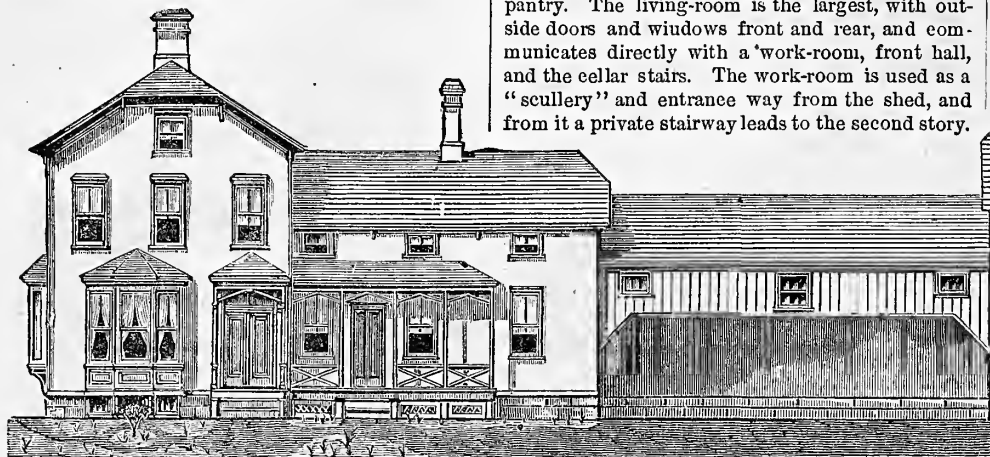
FRONT ELEVATION OF HOUSE, SHED, AND BARN JOINED TOGETHER, AND COSTING \$3,000.
